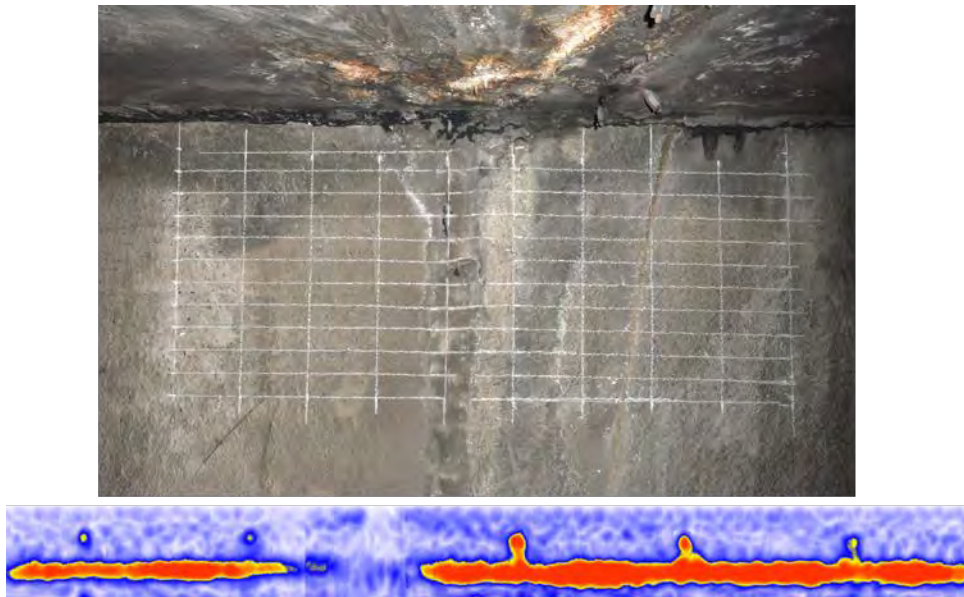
B-scan of precast divider panel showing backwall reflection and reinforcement.
